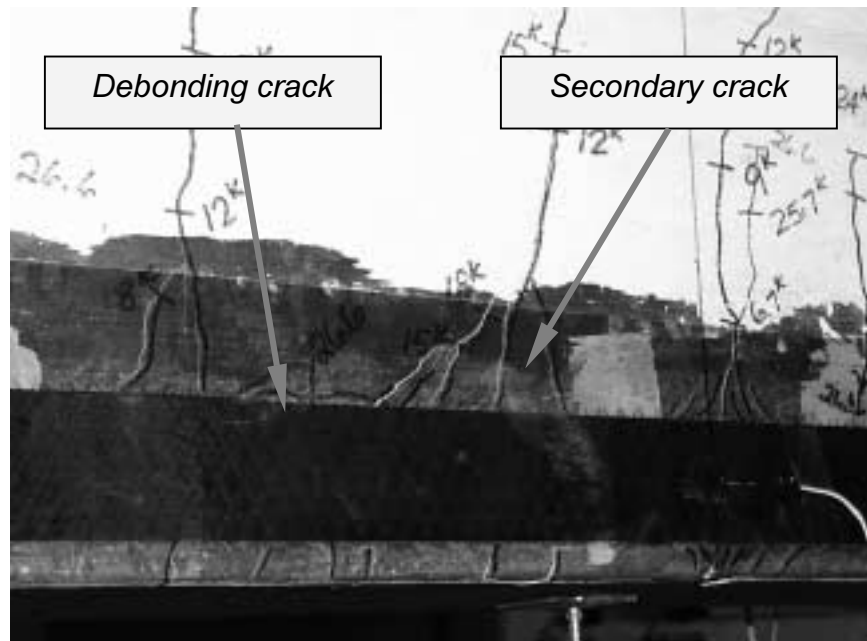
Propagation of Secondary Cracks into a Debonding Crack in Specimen B3
